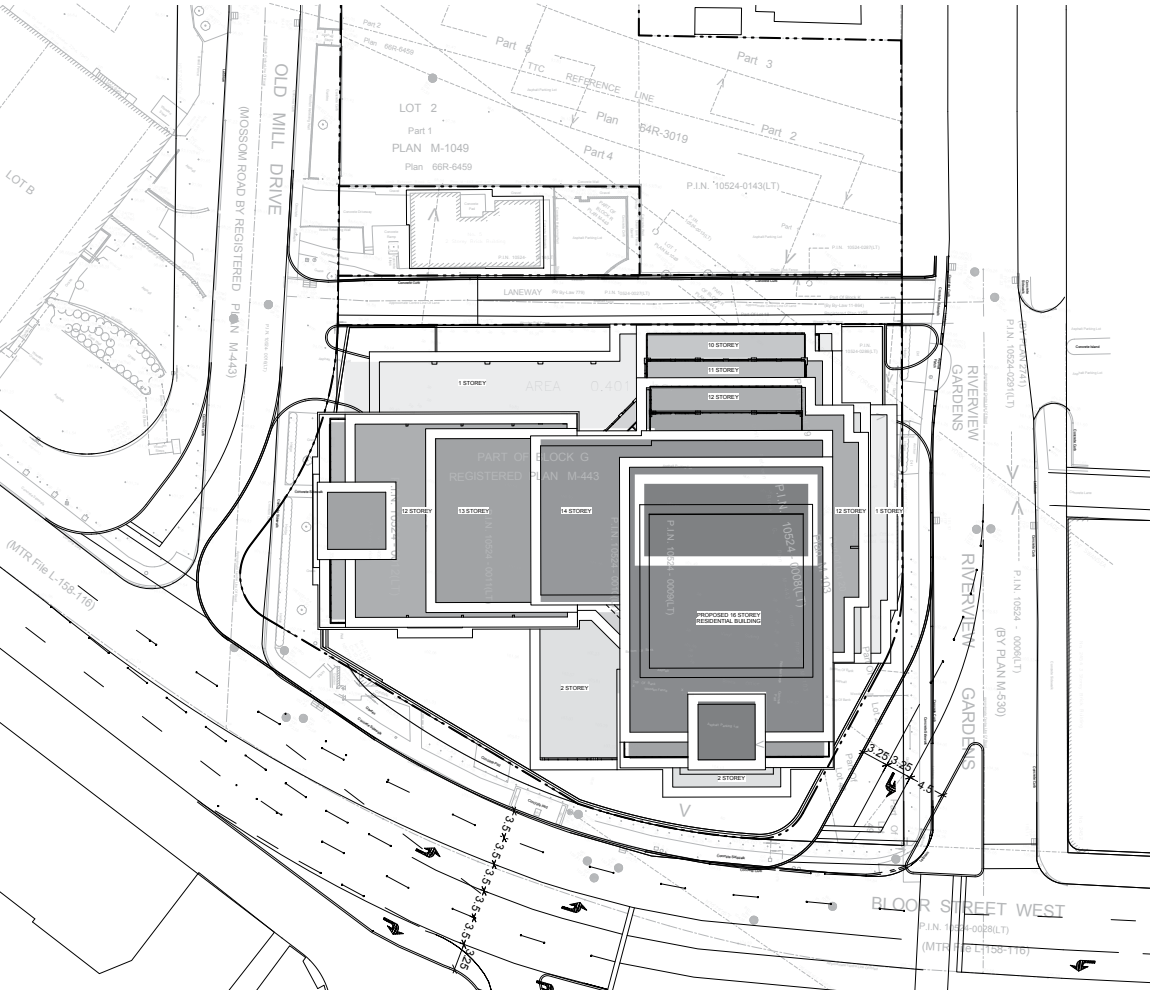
Proposed development at 2490 Bloor Street West (Building B), Site Plan
